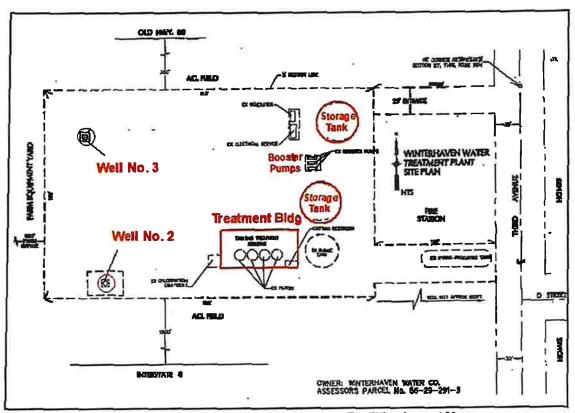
WCWD Well Site and Treatment Facilities Layout Map
